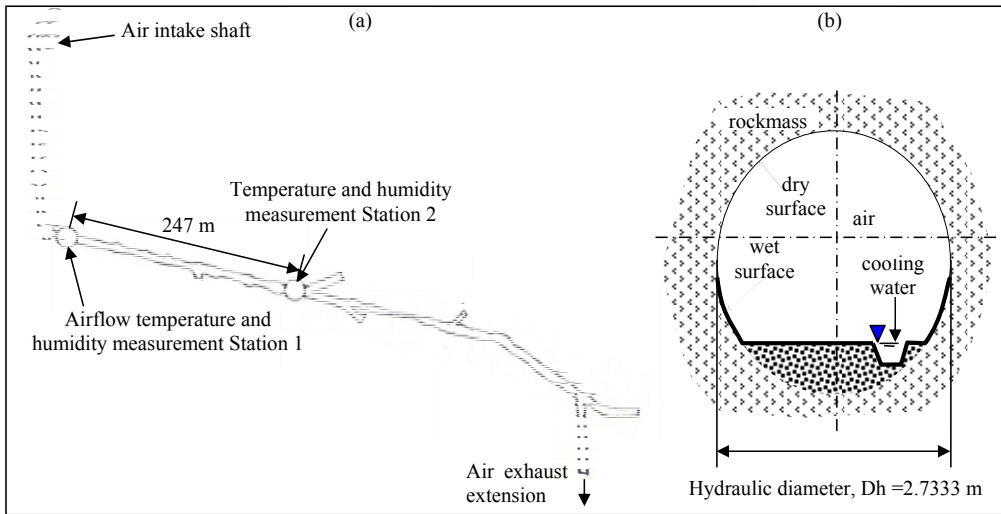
Plan view (a); and cross sectional view (b) of a 247-m drift segment in the 2350 m level drift segment.
